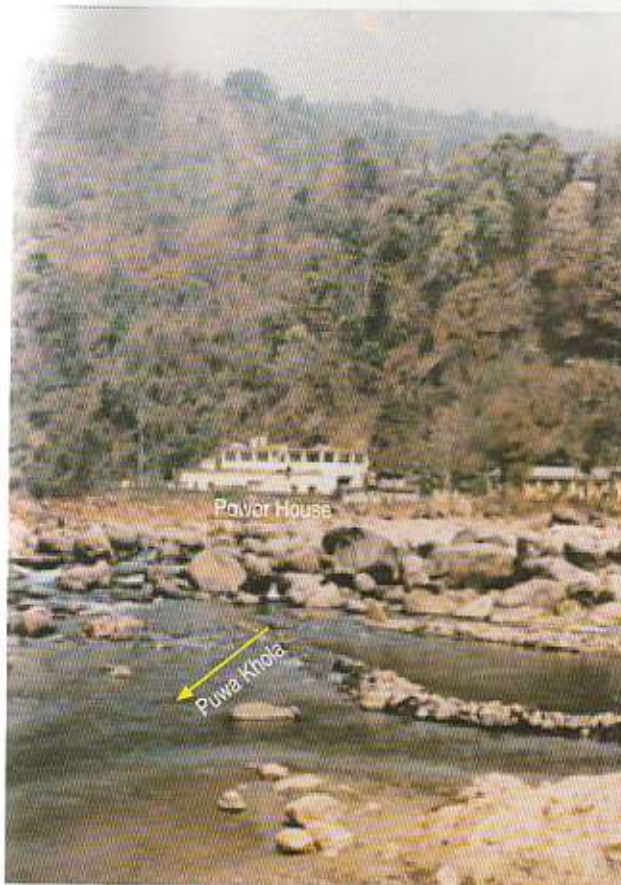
A: Puwa Khola hydro power house on the right bank of Mai Khola, Ilam.
